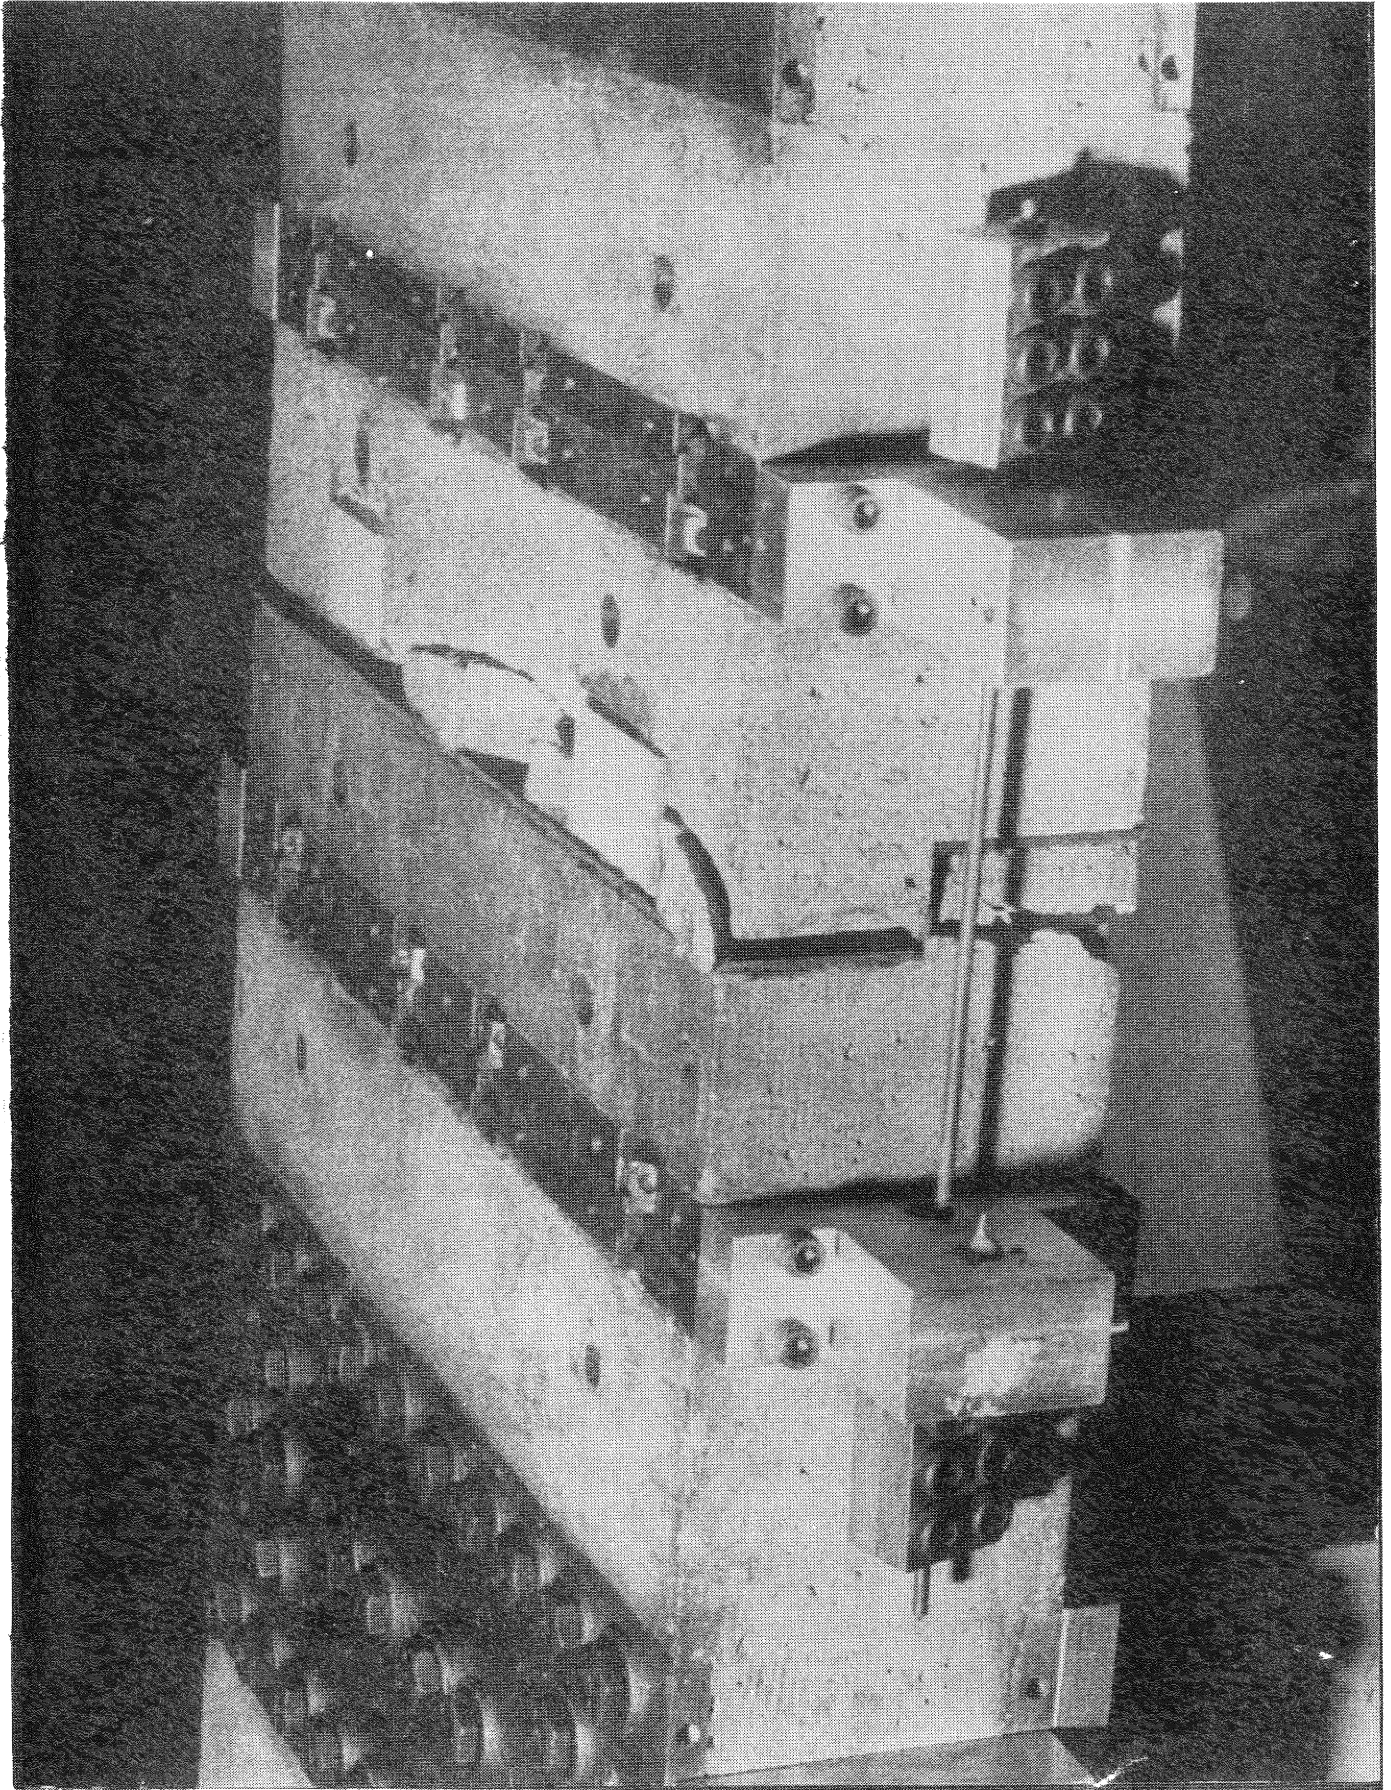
DAMAGED EXPANSION JOINT, TEST X7A.
